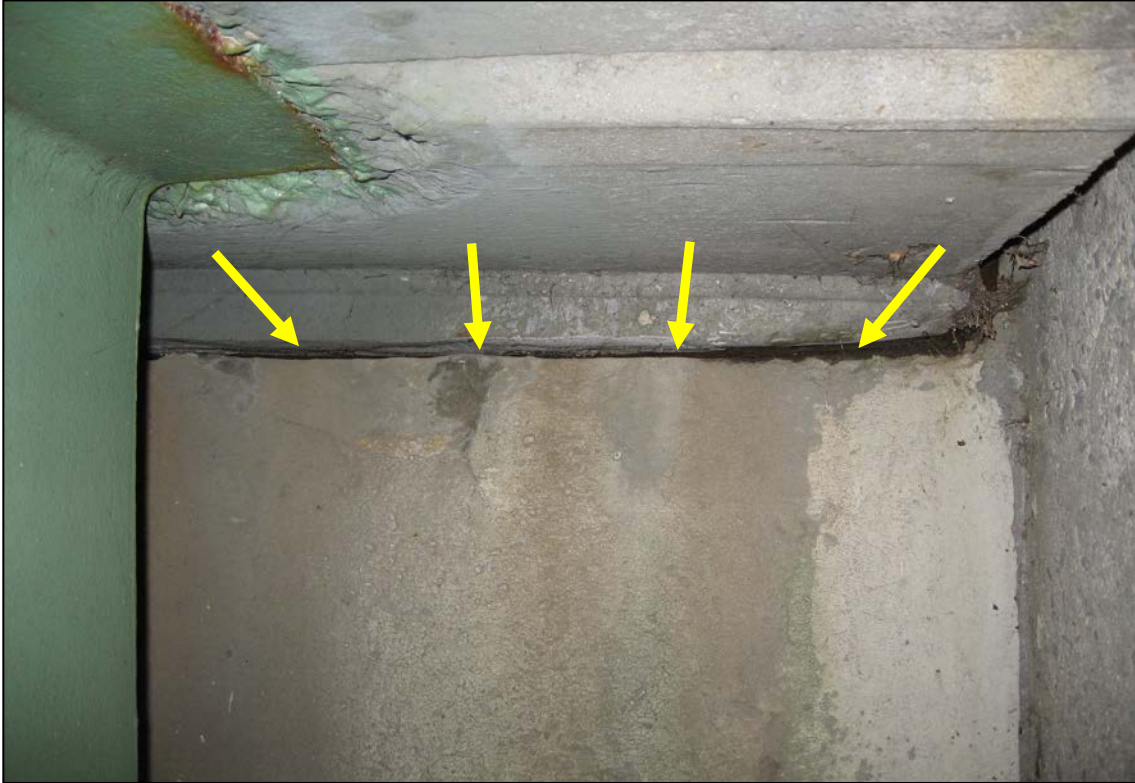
The bond breaker slip sheet, between the top of the abutment backwalls and bottom of the overlying bridge deck (Typ.), is an ACM as per the record plans. Photo is looking north, at the right side of the End Abutment.
